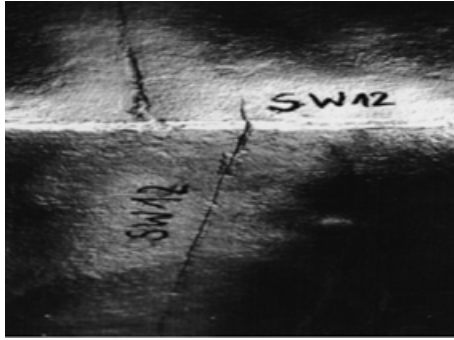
Cracking of Penstock due to Hydraulic Transient-Inside View (Source: A. Adamkowski-2001)
